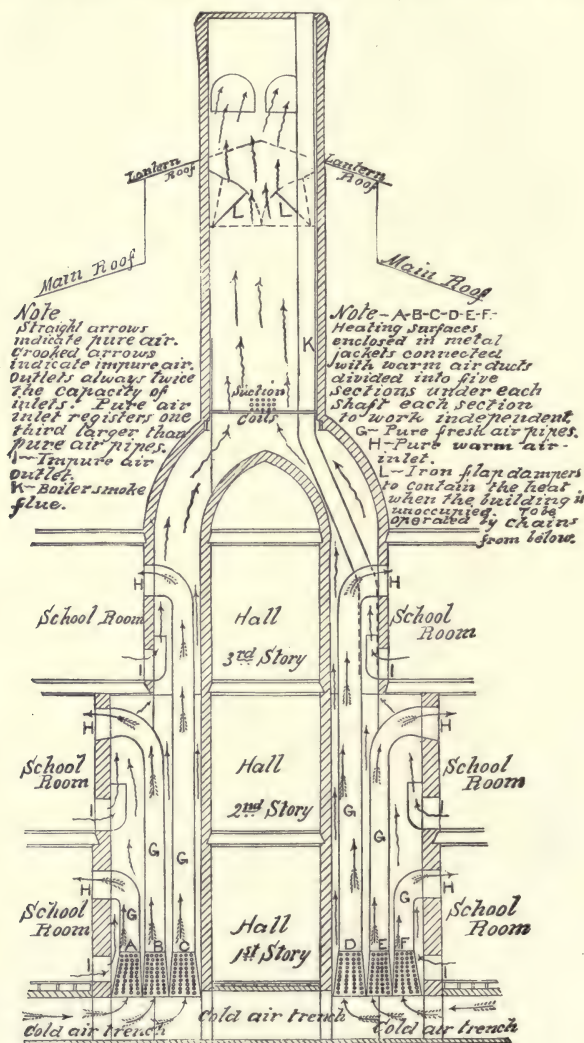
VERTICAL SECTION OF SCHOOL BUILDING.
